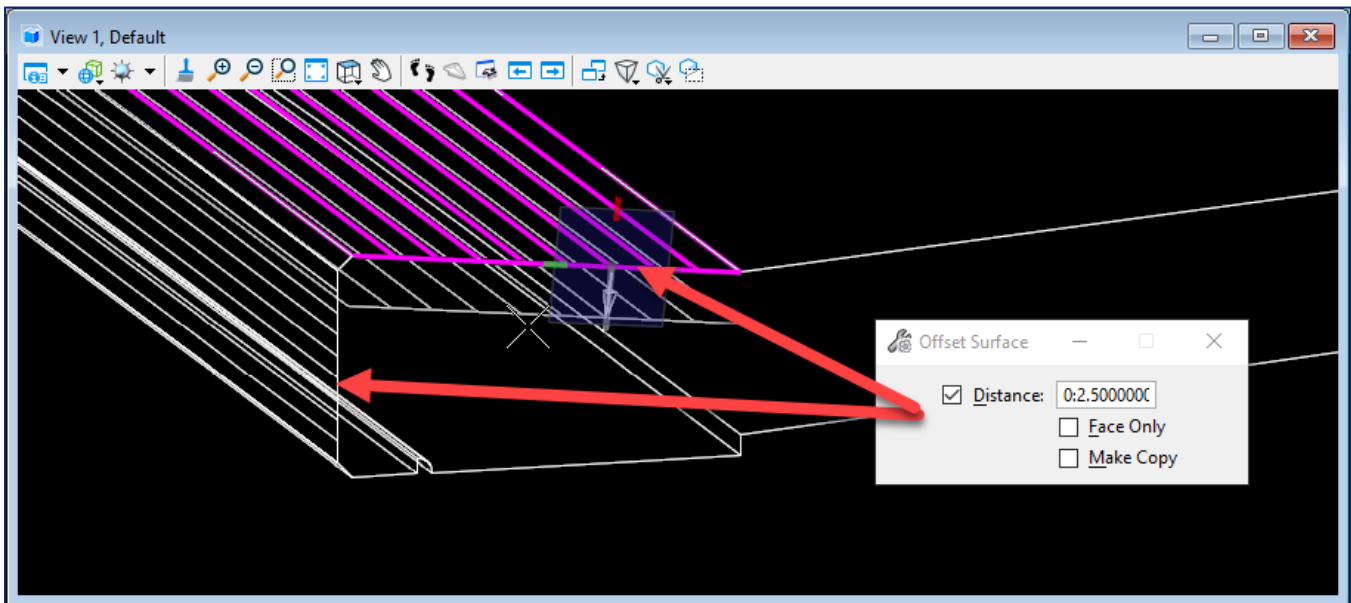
Offset Surface Tool on Extracted Deck Faces for Cover and Rebar Thickness
